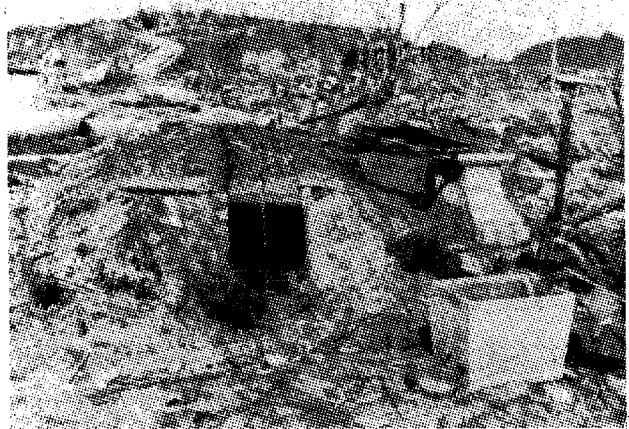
Undamaged earth-covered family shelter in Nagasaki.
